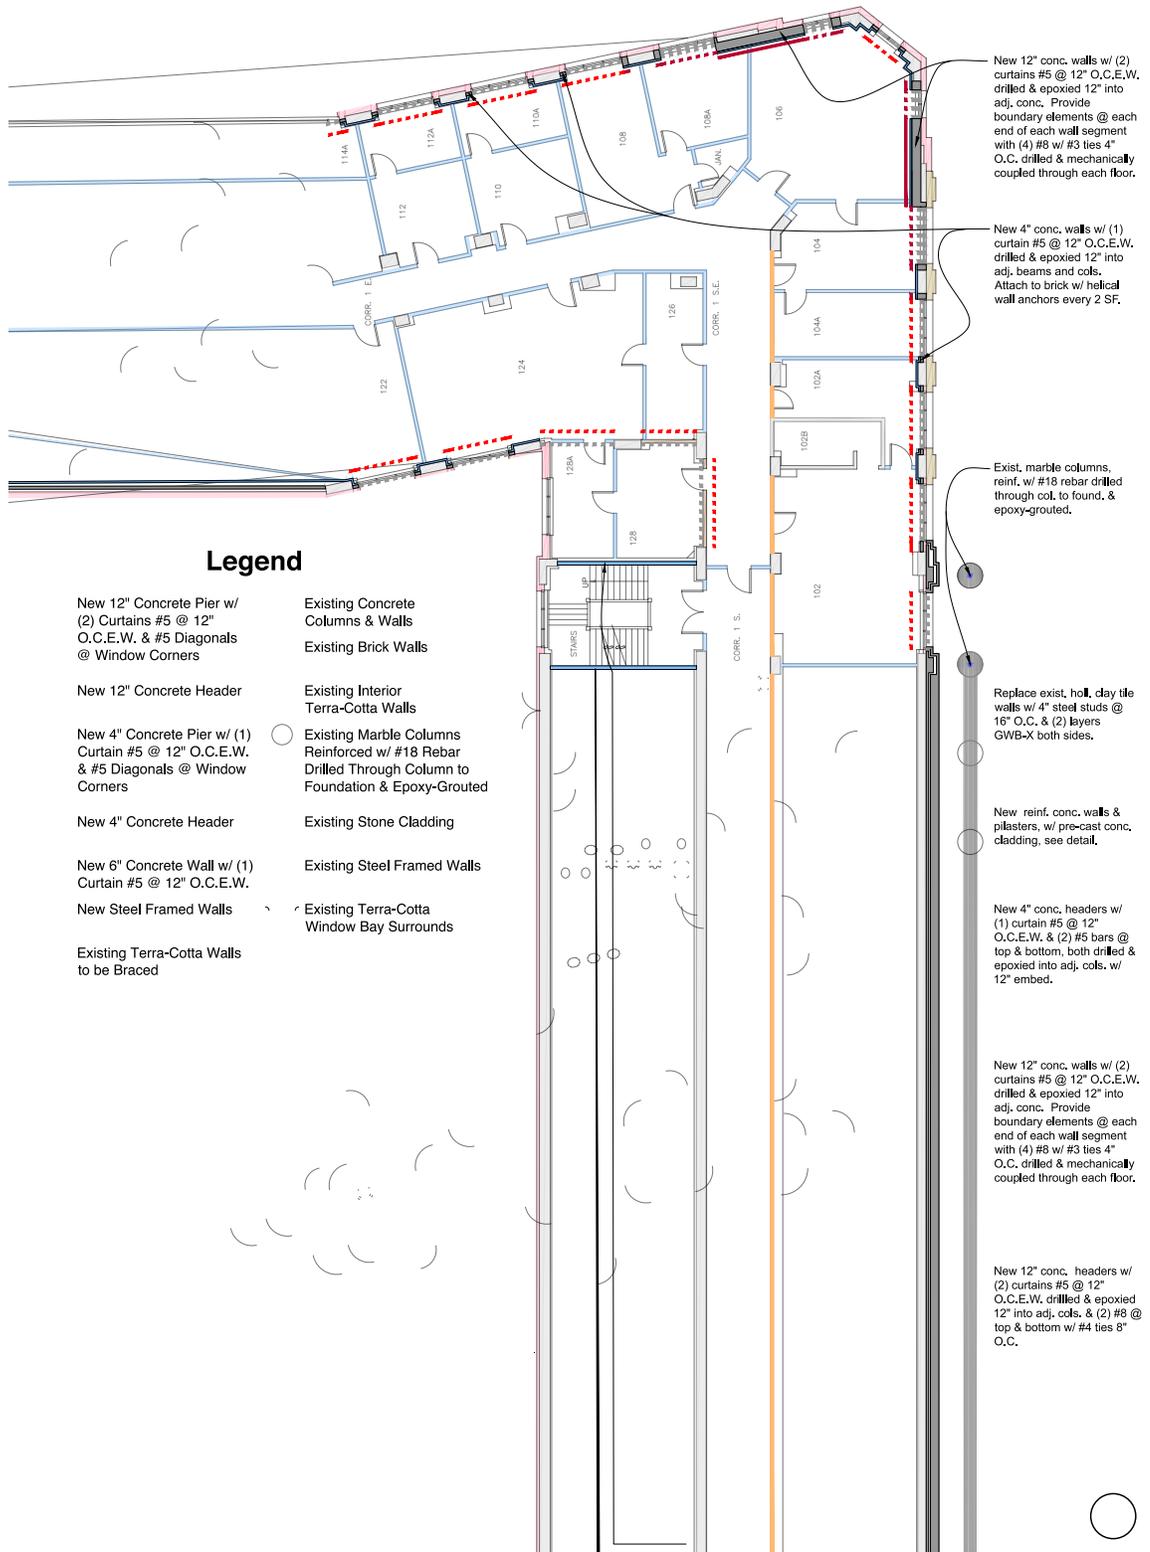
(4): Structural Reinforcing of Building Frame - Floor Level 1
